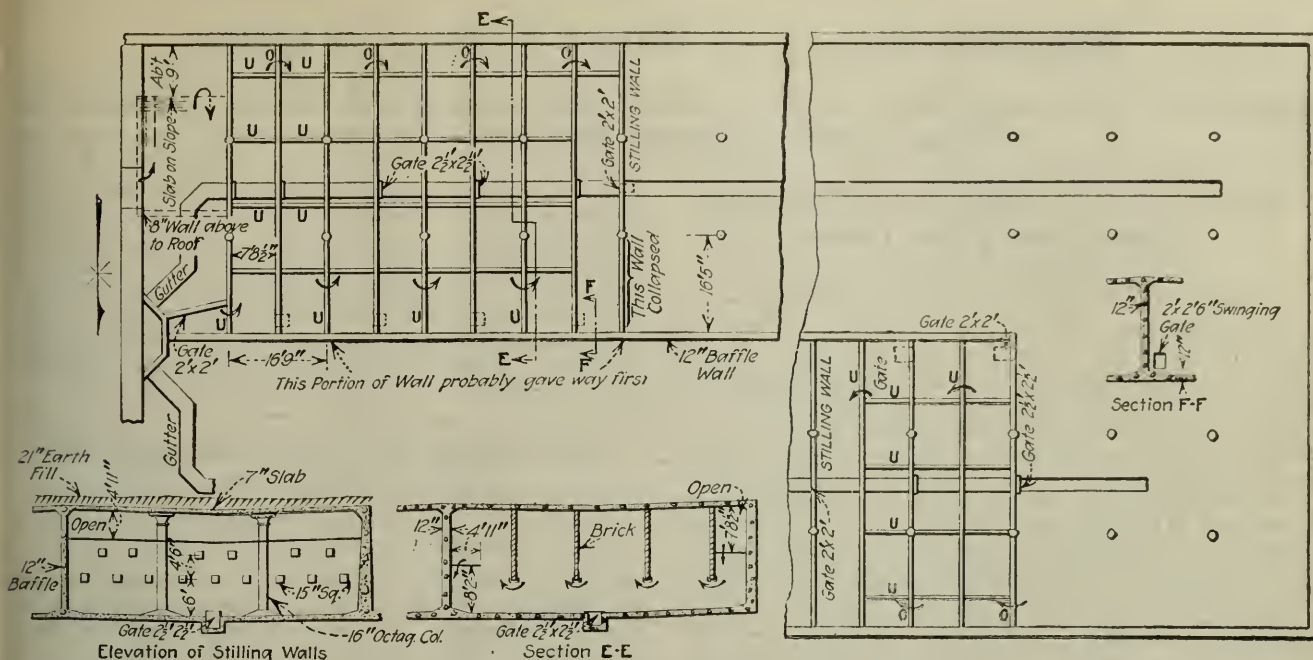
PRIMARY AND SECONDARY SYSTEM OF MIXING BAFFLES AT TOLEDO FILTRATION PLANT
